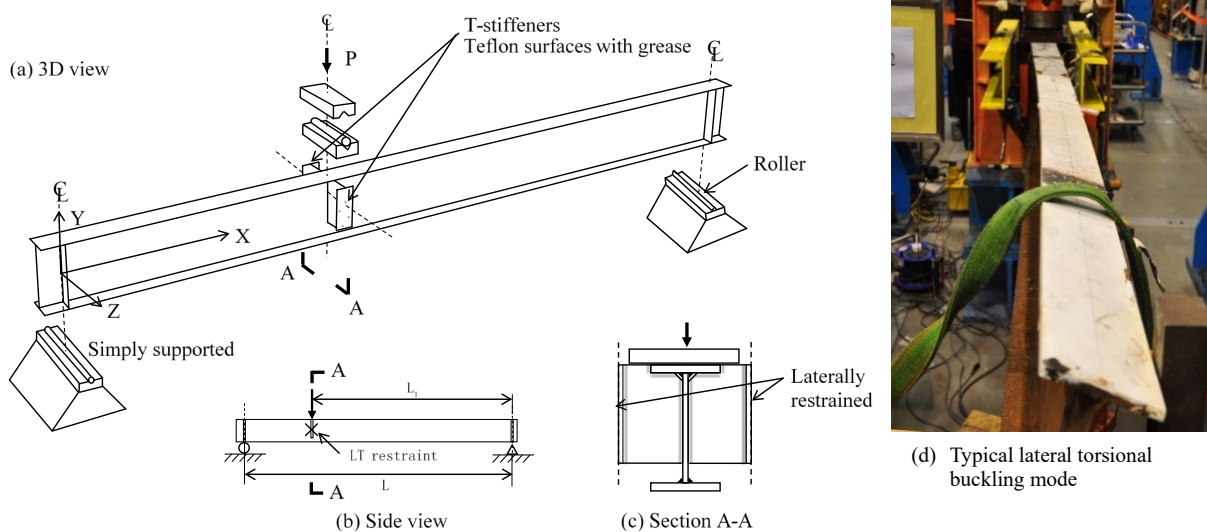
Typical set-up and failure modes of partially restrained beams of S690 welded I-sections
